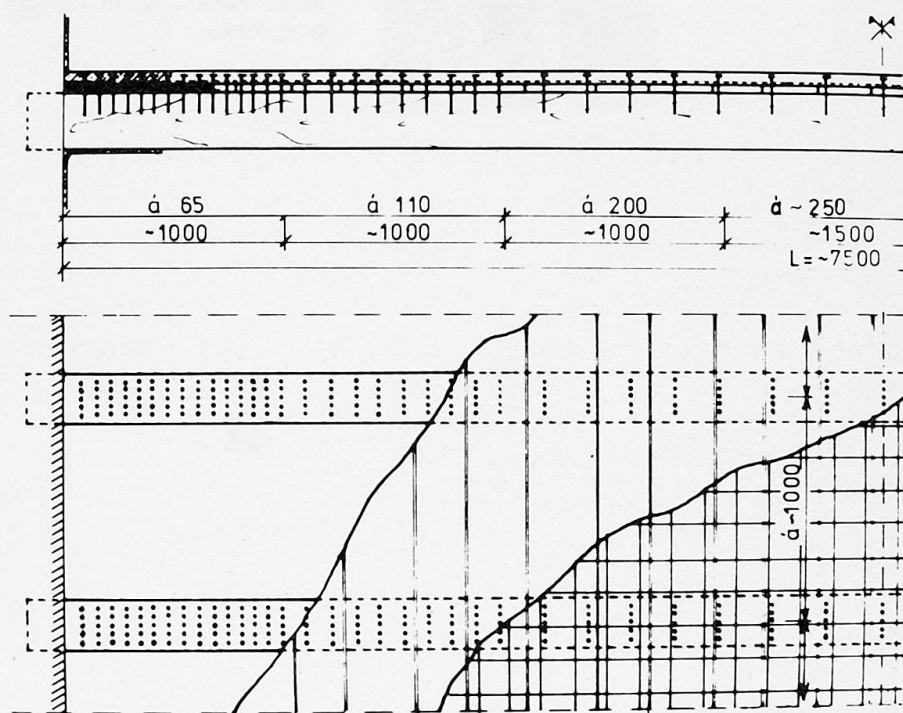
Wooden beam ceiling construction with the beams in distances.
